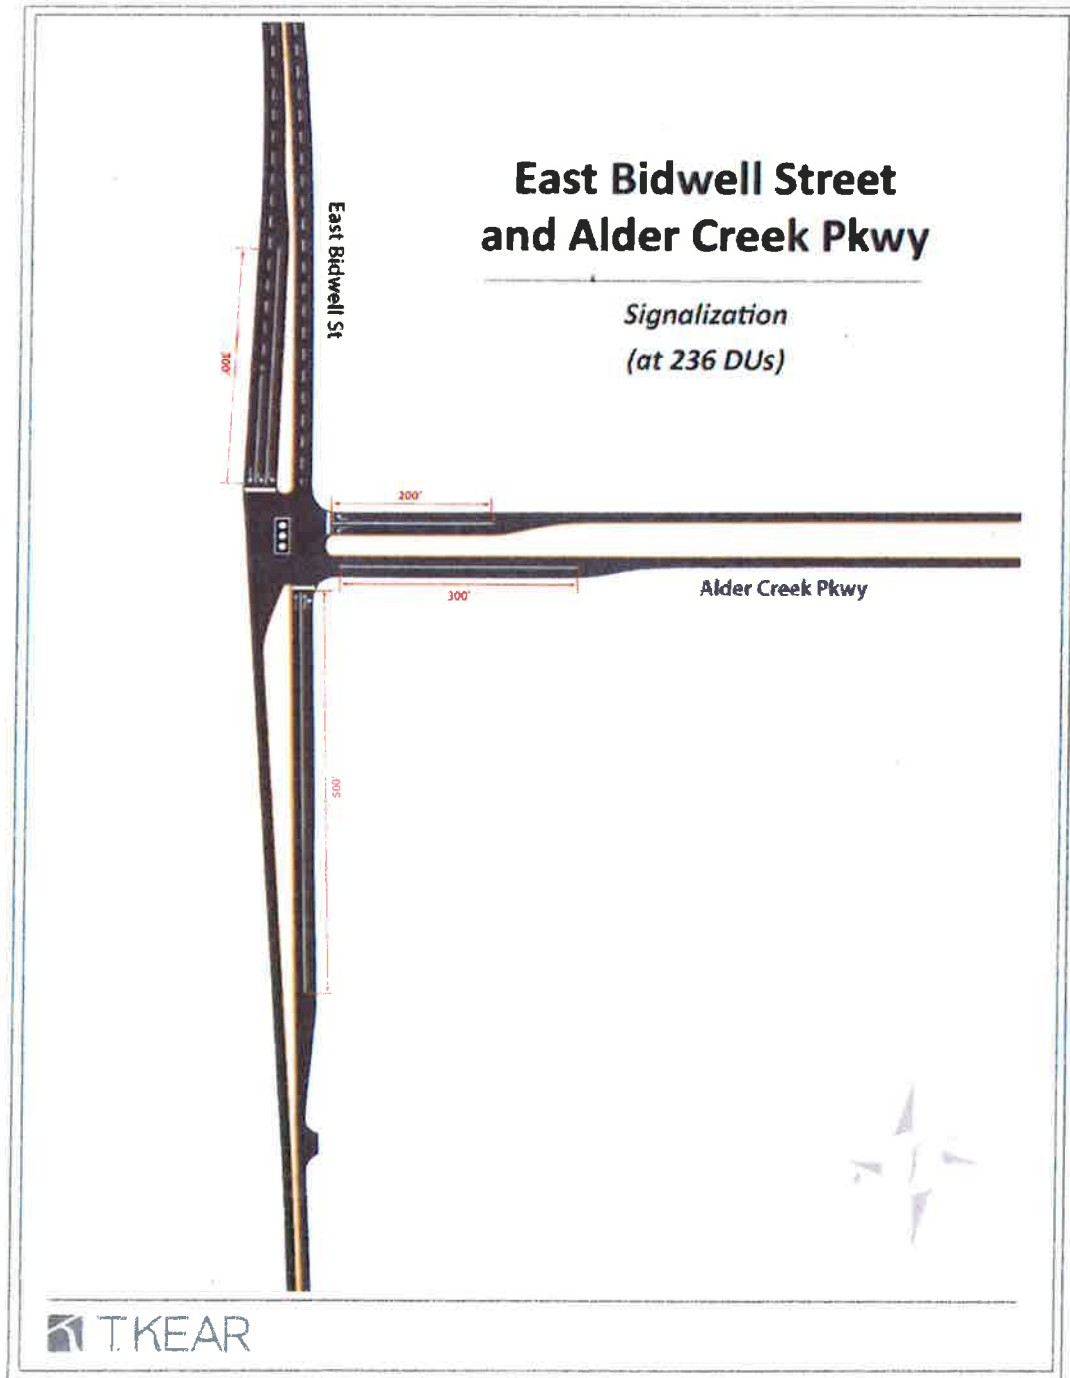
East Bidwell Street/Alder Creek Parkway
